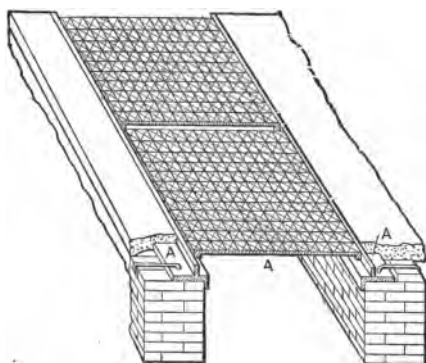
Cast Iron Trench Plates and Rails or Borders
